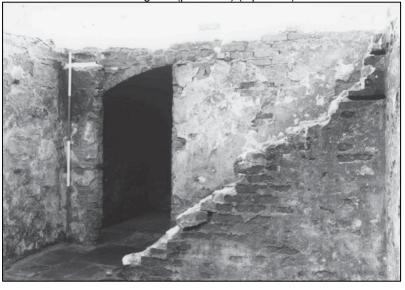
Building D, S wall of N cellar space, looking SE (photo 7/8).
